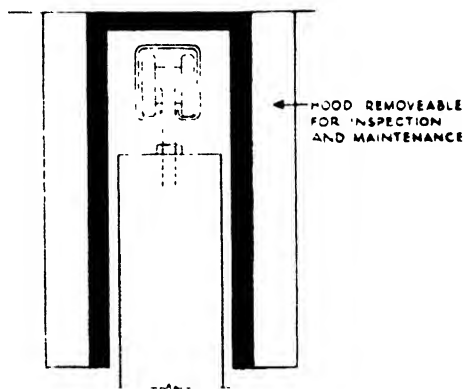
TRAP SEAL TO HEAD OF SLIDING DOOR
